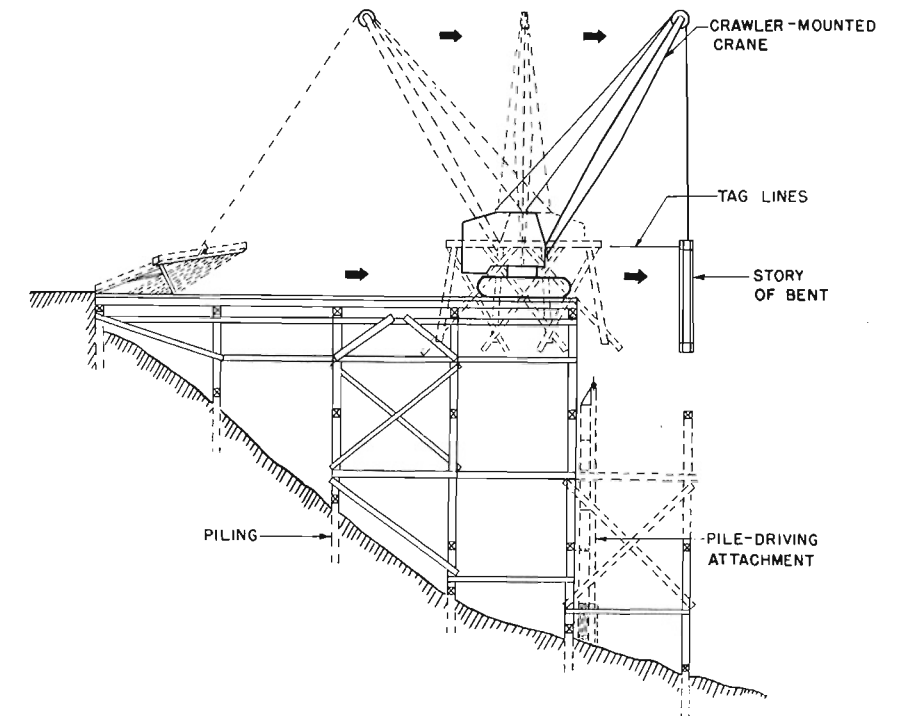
Crawler-mounted crane operating from deck of bridge to drive piles and erect timber towers within reach of crane.
